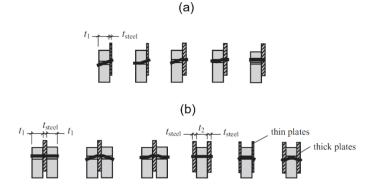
Plastic failure modes of (a): non-symmetric timber-to-steel connections; (b) symmetric timber-tosteel connections. Adapted from *BS EN 1995* [1].
